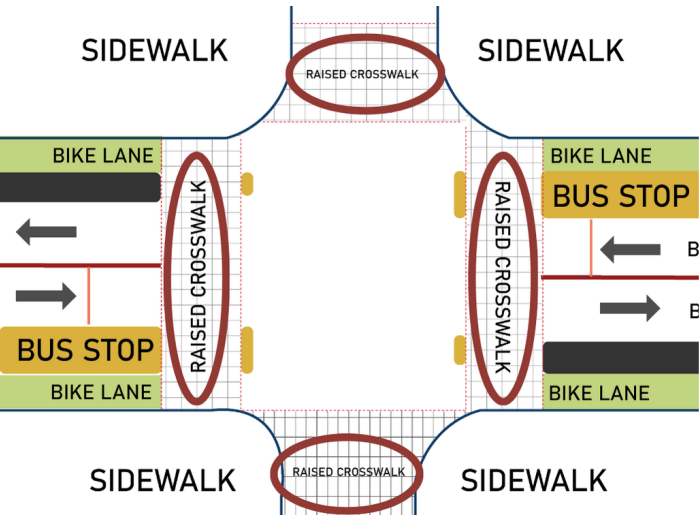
Raised Crosswalks in Redeveloped Streetscape
